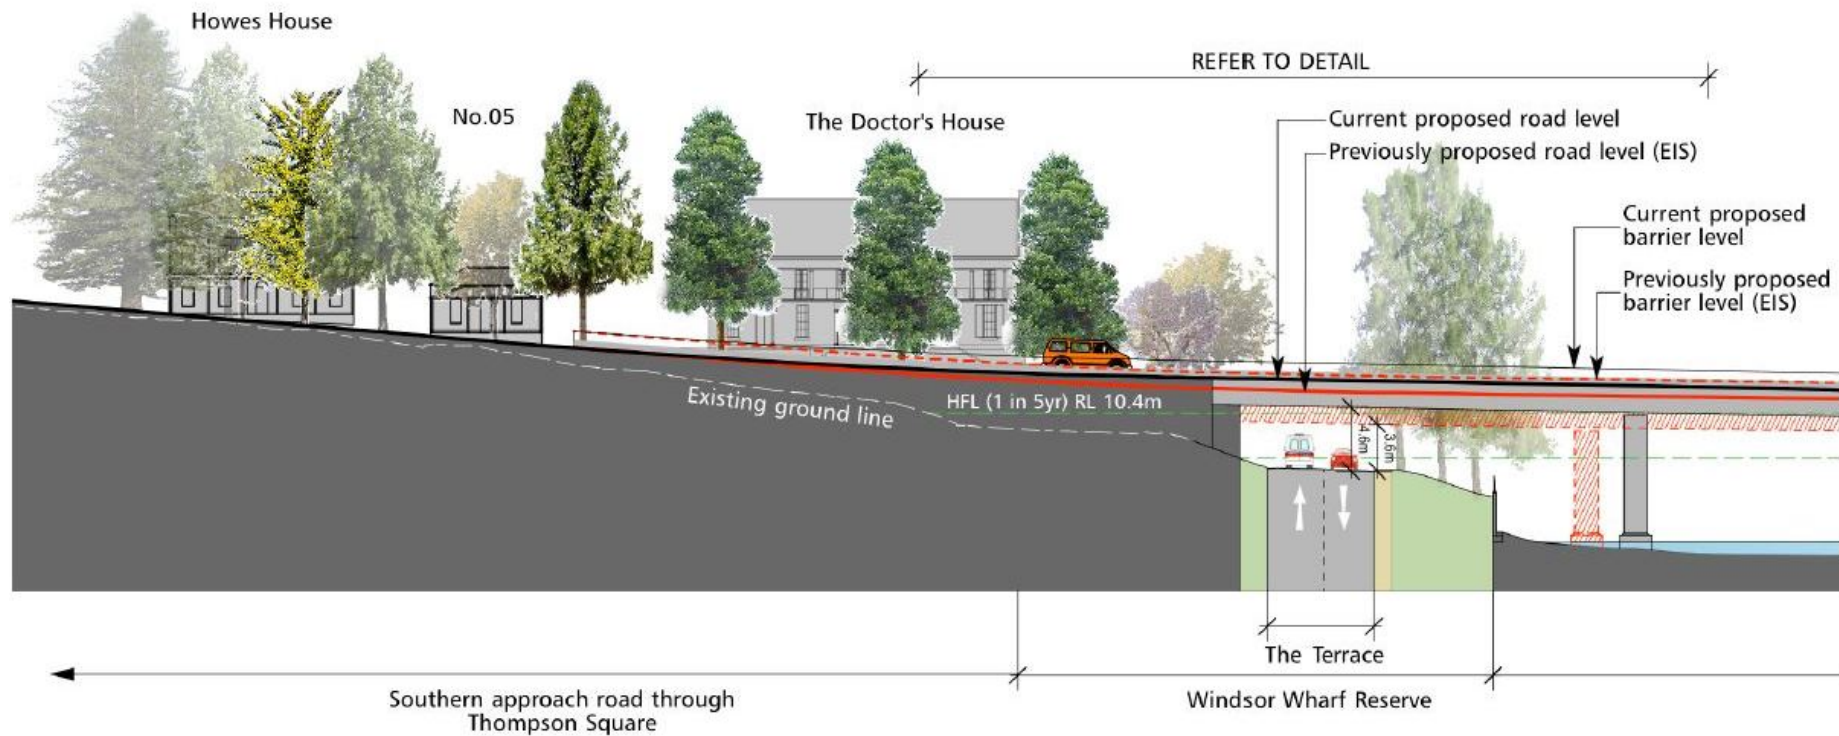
Longitudinal section of the proposed changes to the replacement bridge deck height (and barriers) and the proposed new location of the piers (in grey). View north- west from the Windsor bank. Source: Spackman Mossop and Michaels.
